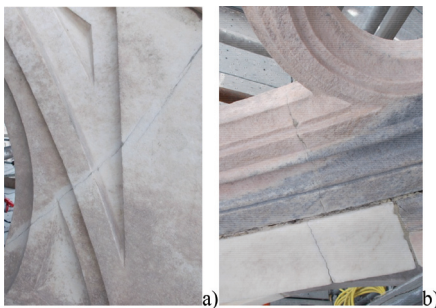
,b. Structural cracks on marble units: a) cracks on an old stone unit in AT6 and b) crack going through an old and a replaced marble unit in AT4.
